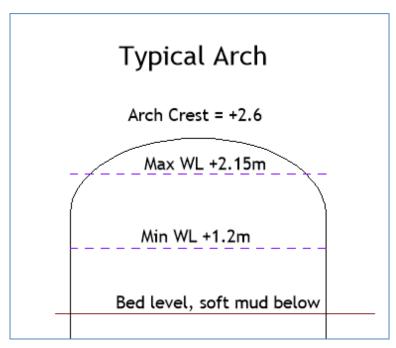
Typical under-building arch dimensions (Max and min water levels are based on Figure 1)
